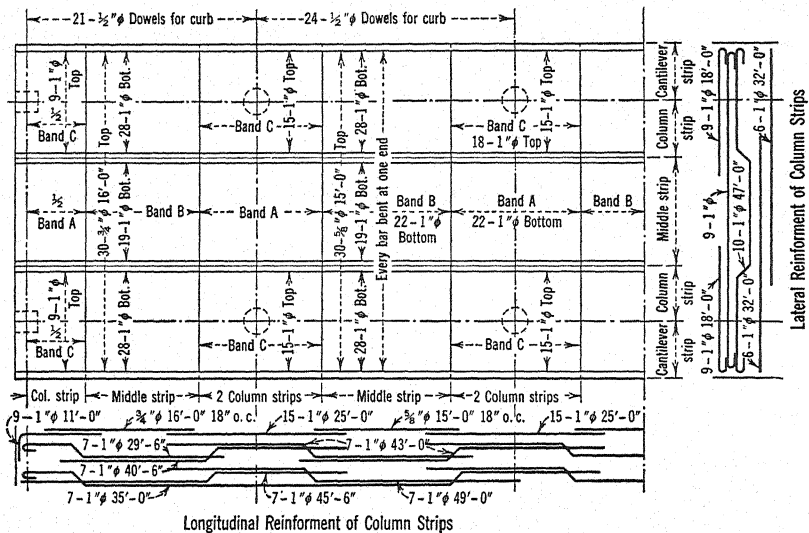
Example. Reinforcement of Flat-Slab Bridge. (See p. 368.)
